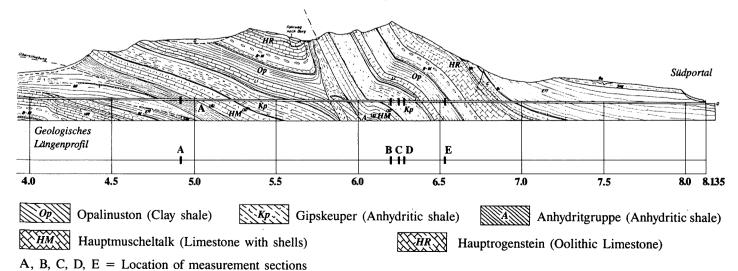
Geological longitudinal section through the southern half of Hauenstein-Base-Tunnel.
